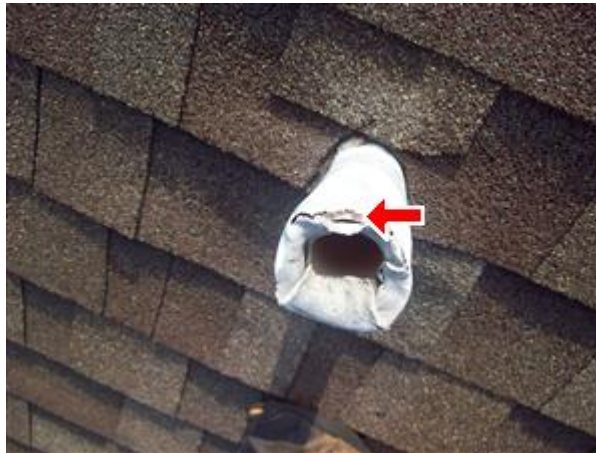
Damaged/deteriorated covering at top of right side plumbing stack, reseal.
